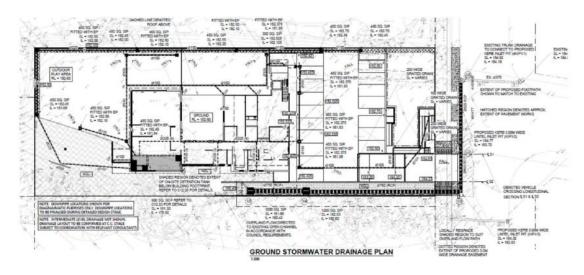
Plan showing Relocation of Existing Stormwater Easement (Source – Engineering Studio Stormwater Plans, dated 11.7.2019)
